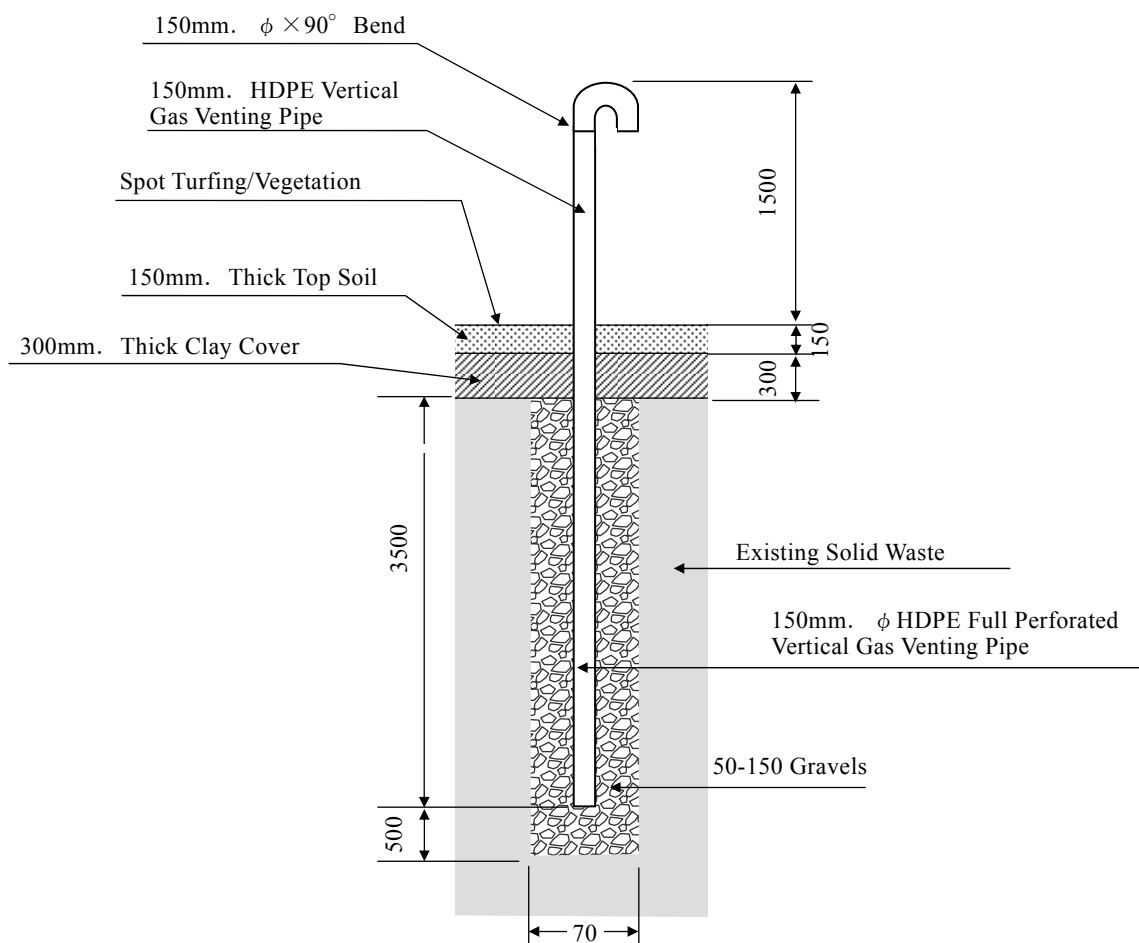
Typical 150mm. ϕ Vertical Gas Venting Pipe Detail
